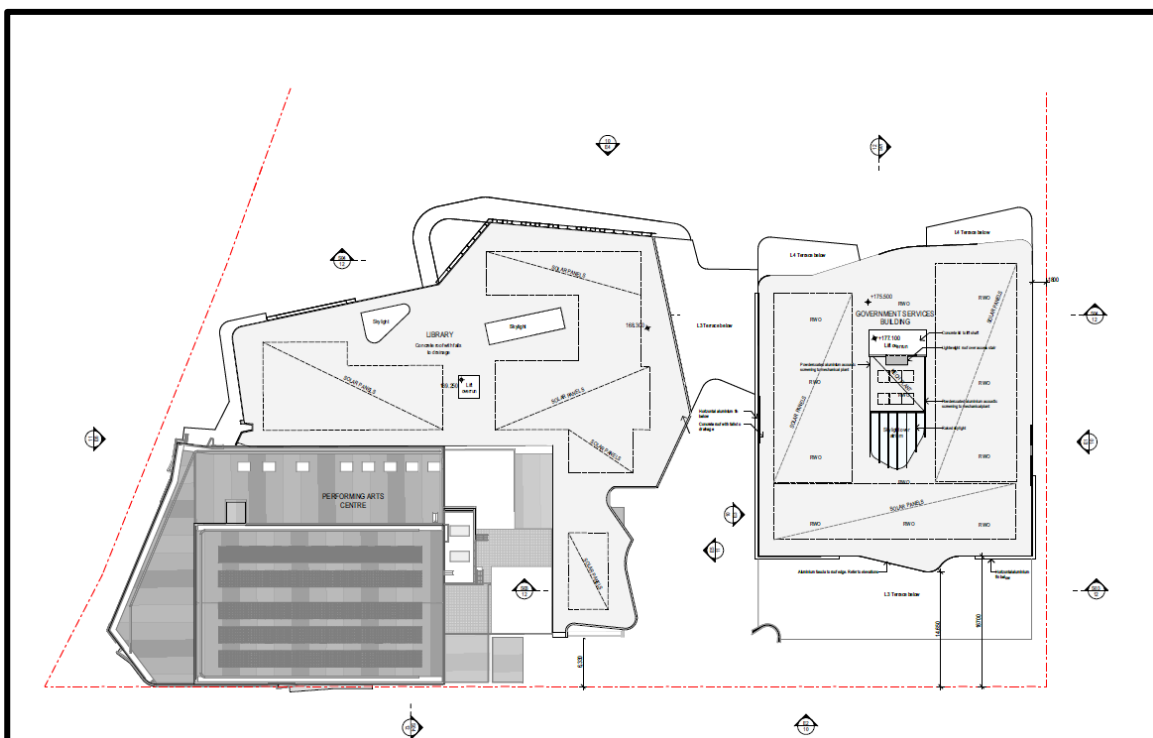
Proposed Roof Plan (Source: William Ross Architects)
